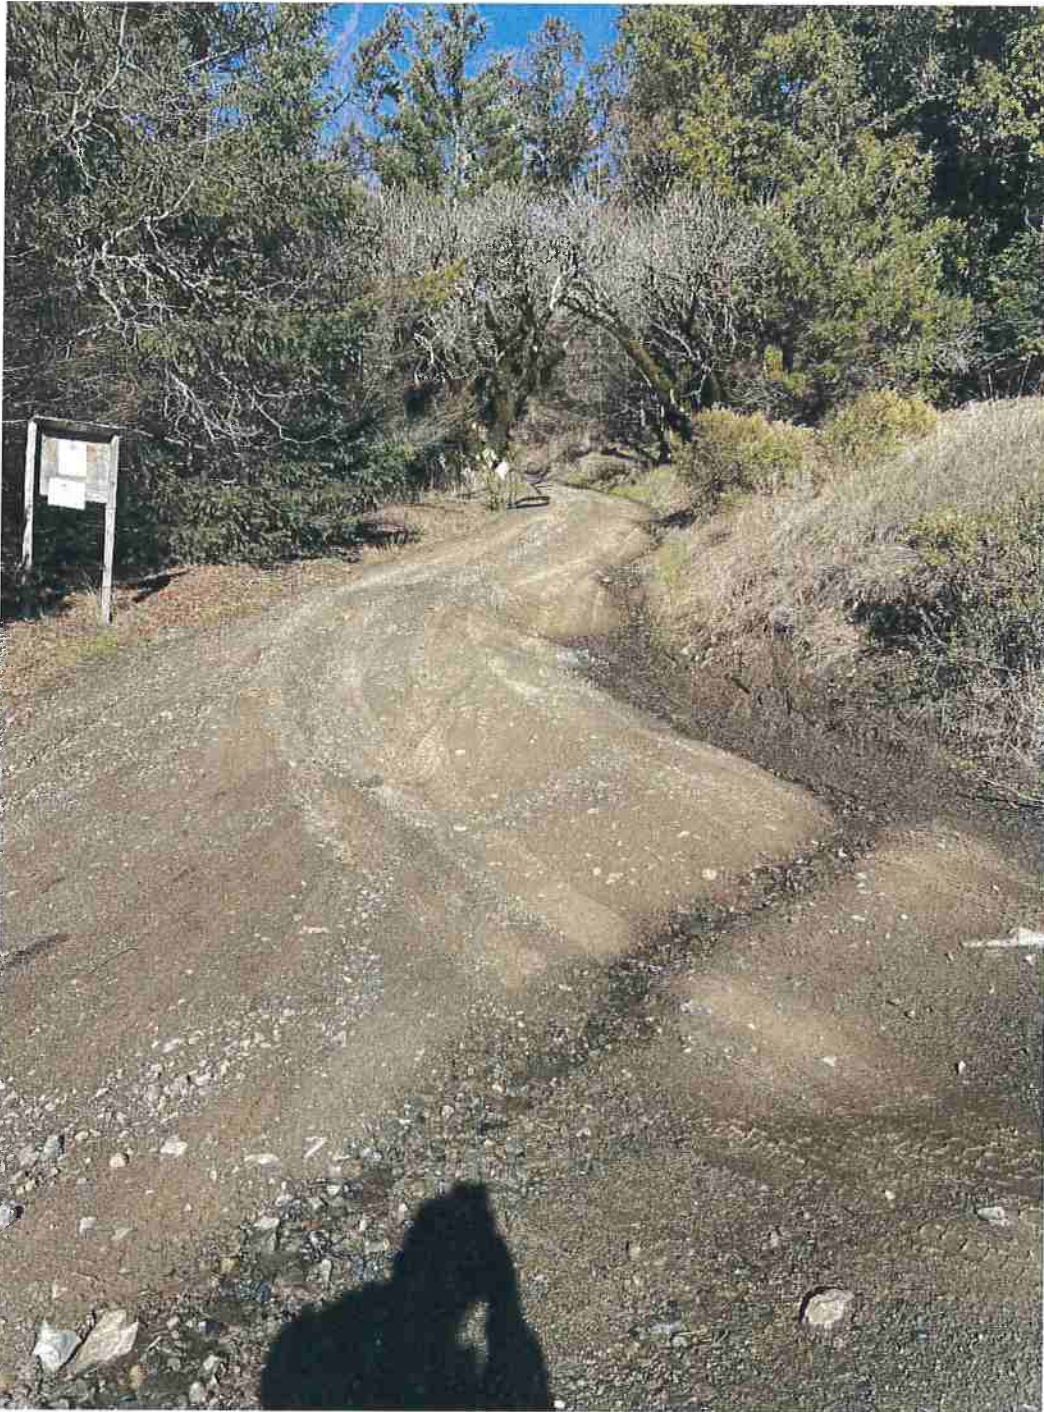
Start of Observation Area SRA(1) looking up Seasonal Road A from Permanent Road (Sylvan Glade Rd.).
